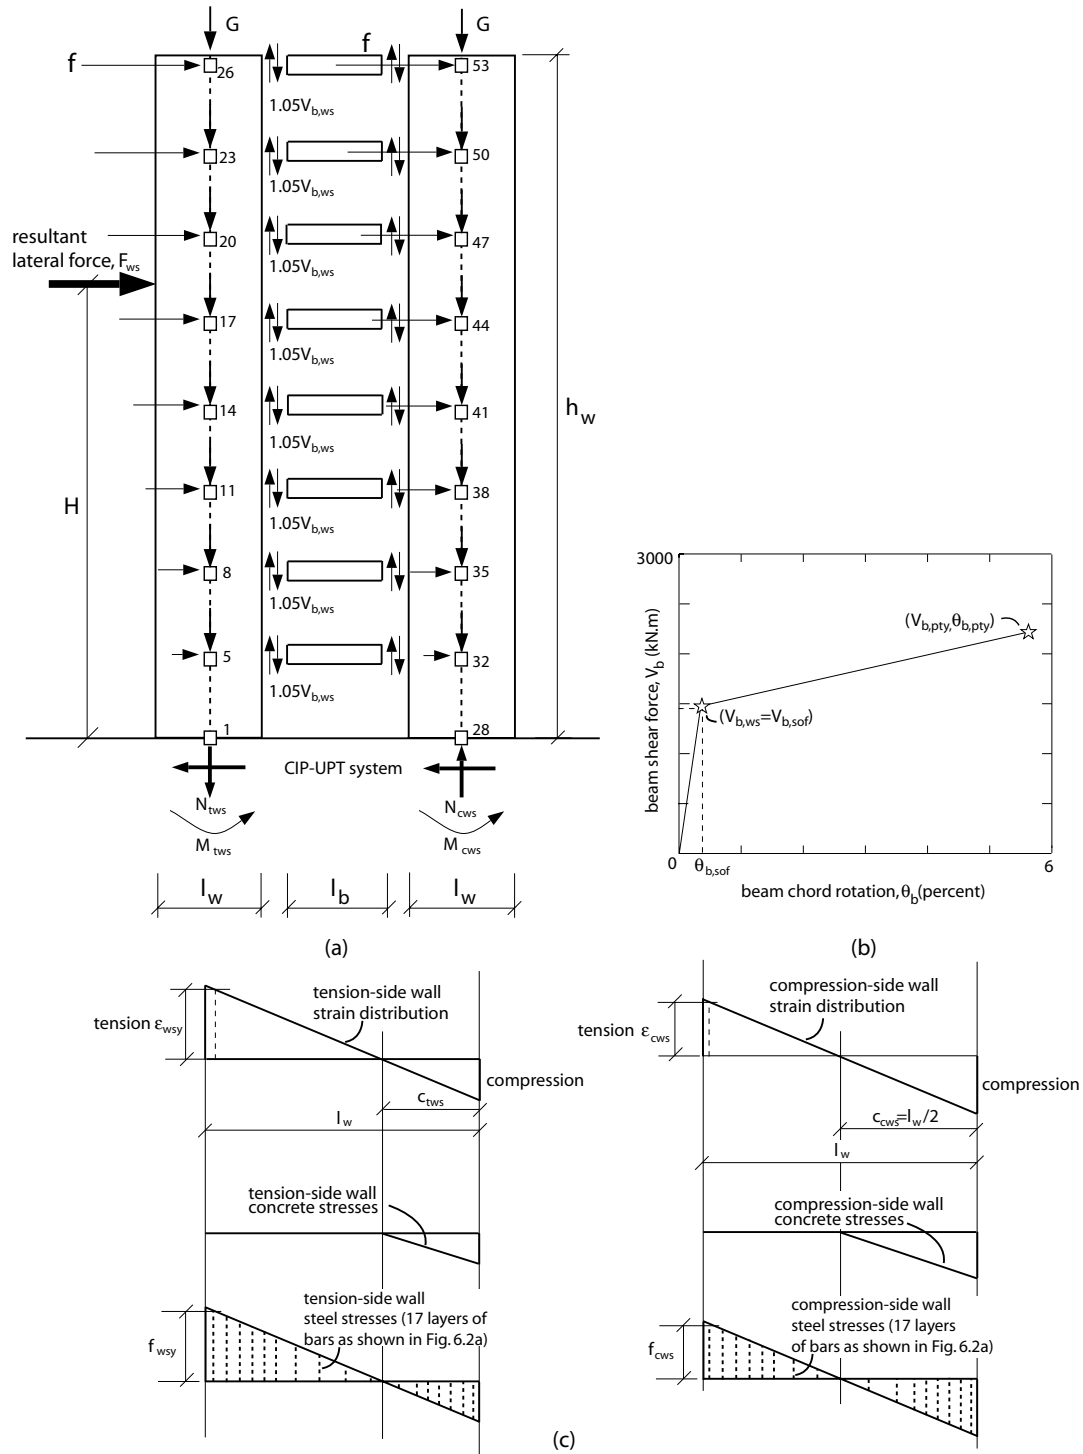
Coupled wall softening state for systems with cast-in-place concrete walls:
